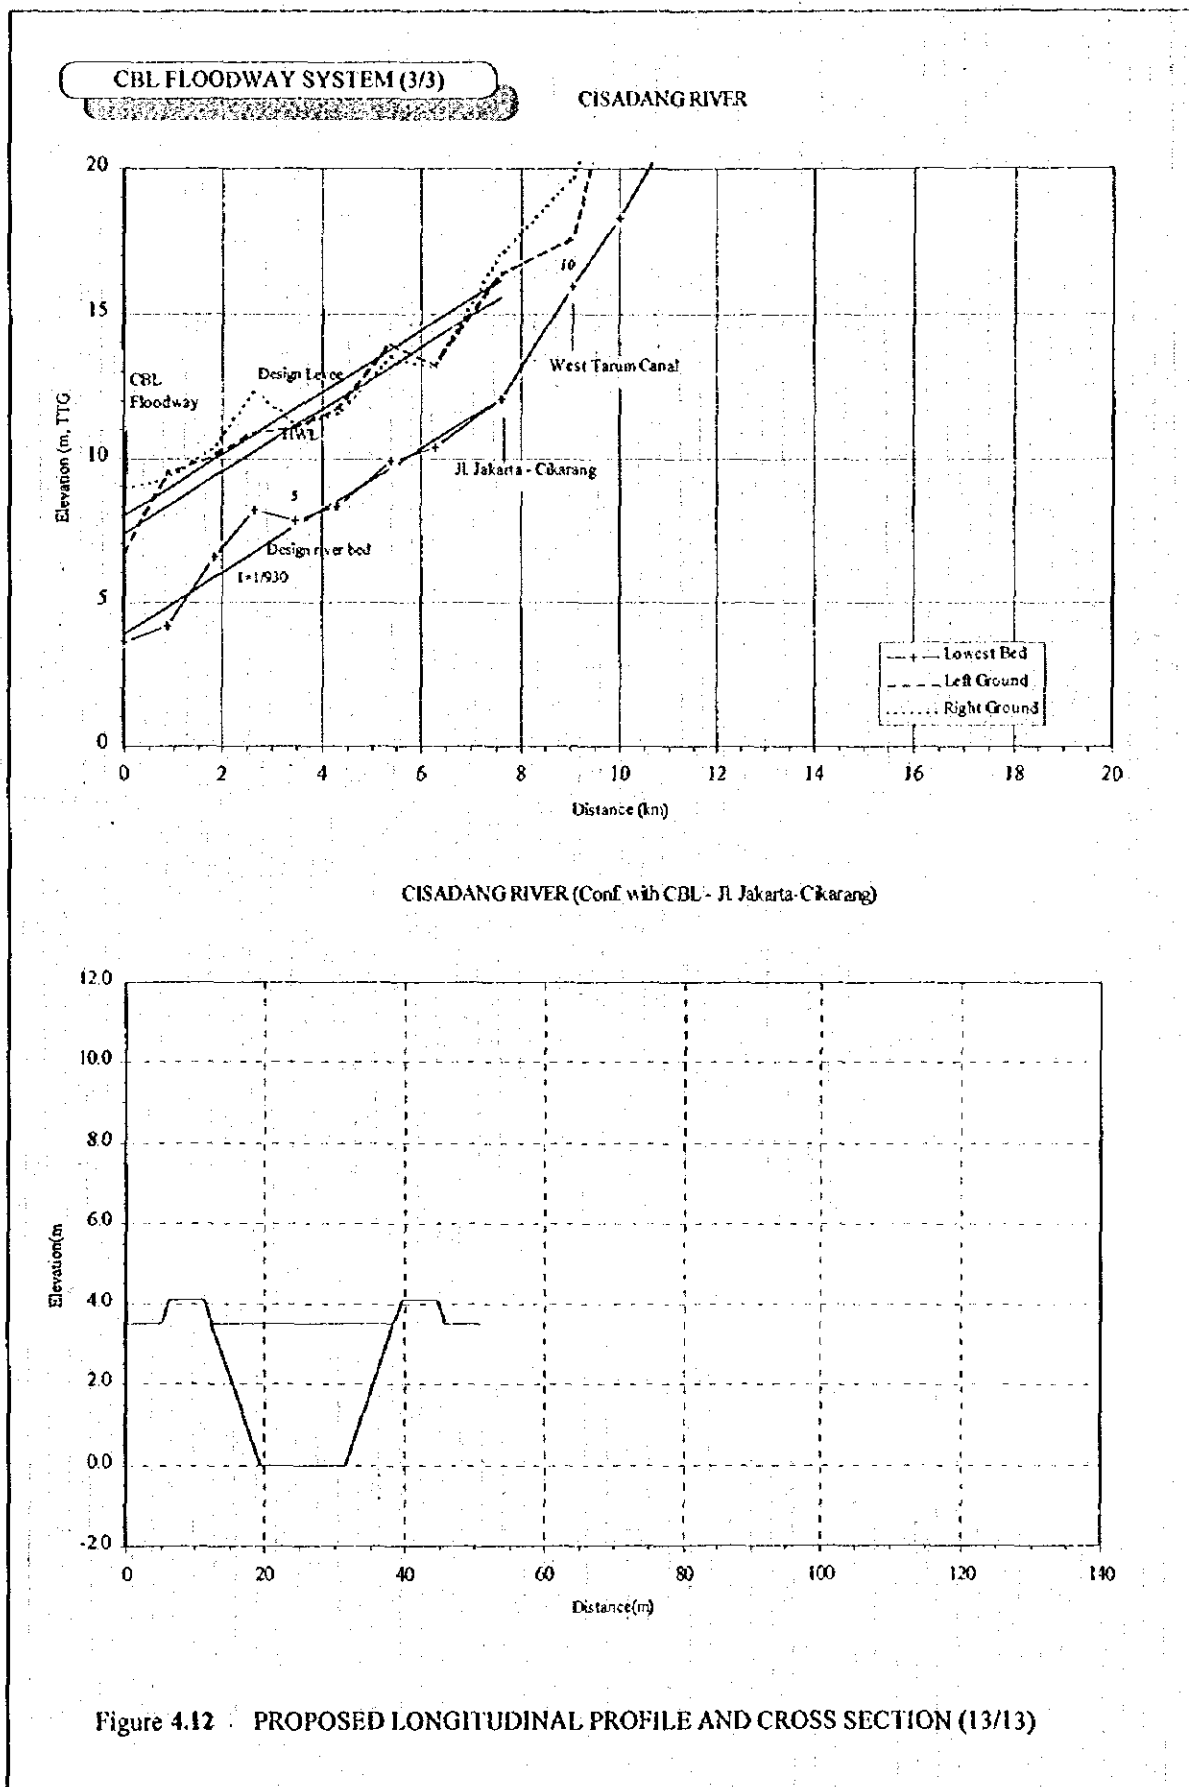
PROPOSED LONGITUDINAL PROFILE AND CROSS SECTION (12/13)
